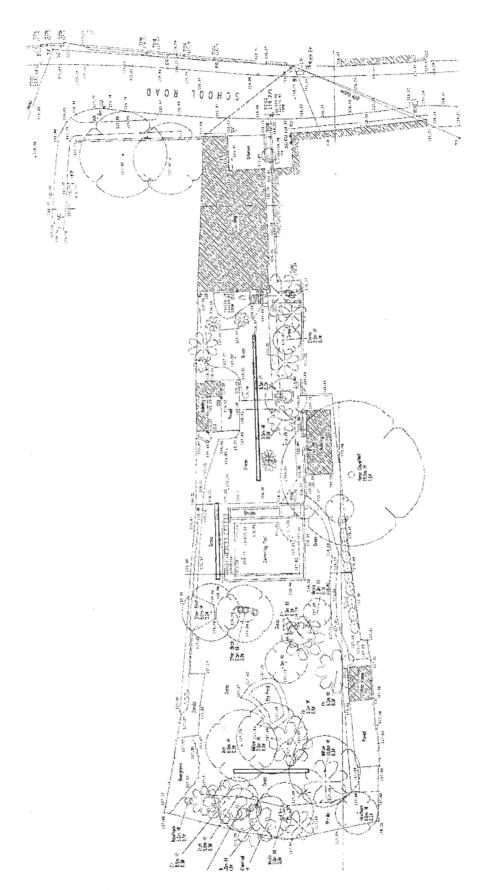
Proposed trench plan (From ULAS Report 2005-010 Fig 7)
